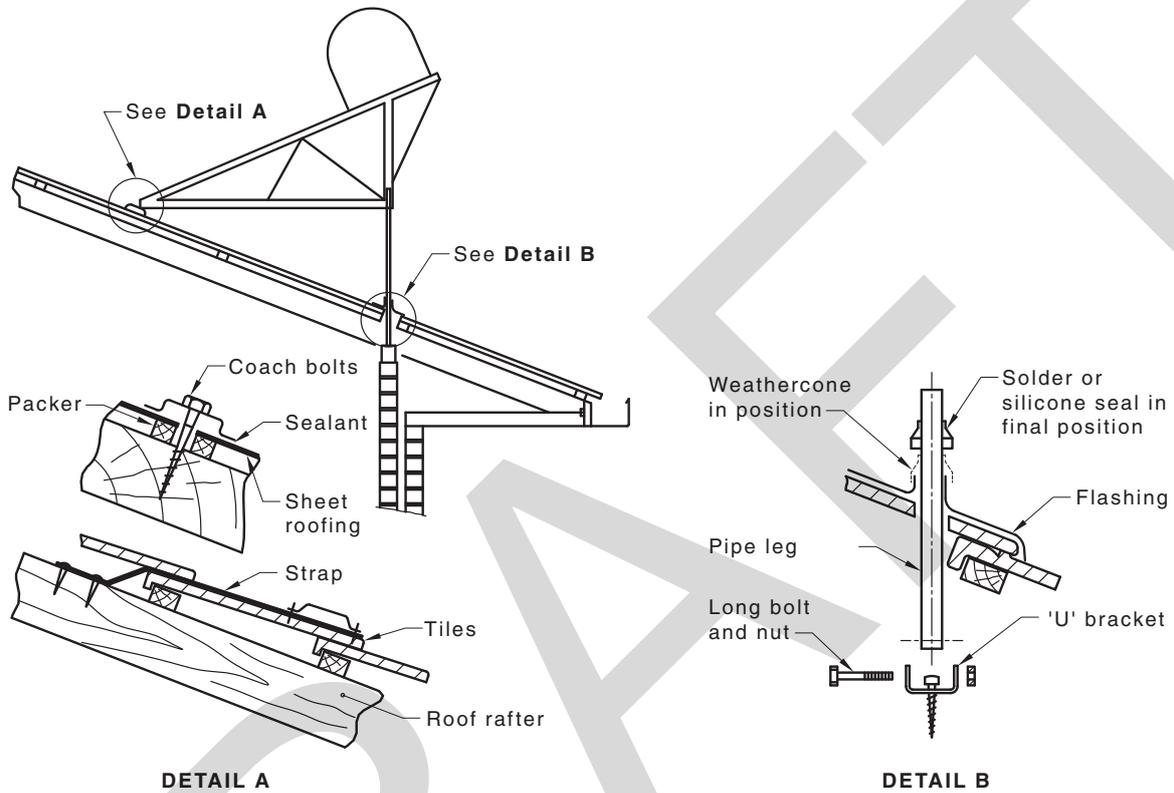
‘AGAINST PITCH’ INSTALLATION
